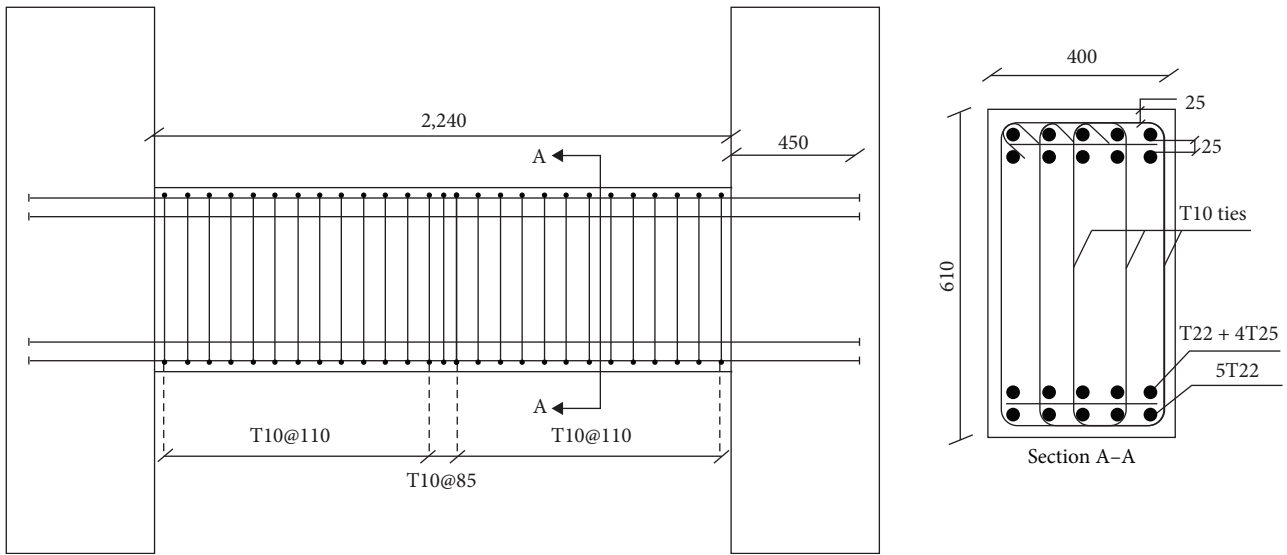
Reinforcement layout and geometry of specimen CB3 [1].
